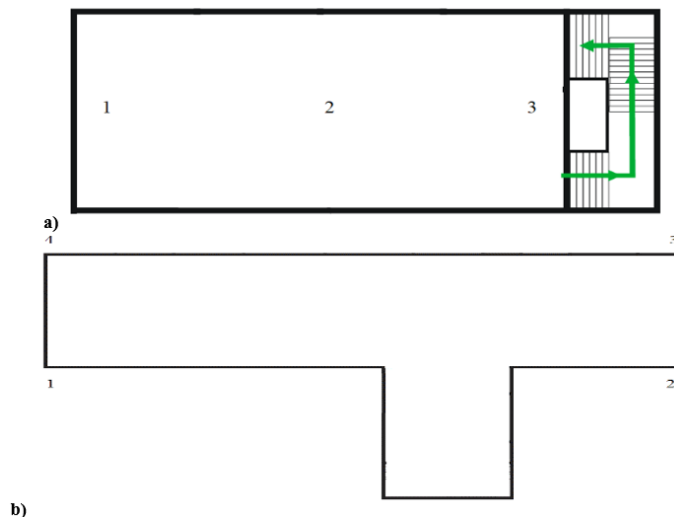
Accelerator Building: a) Intermediate Floor and b) Exterior View
